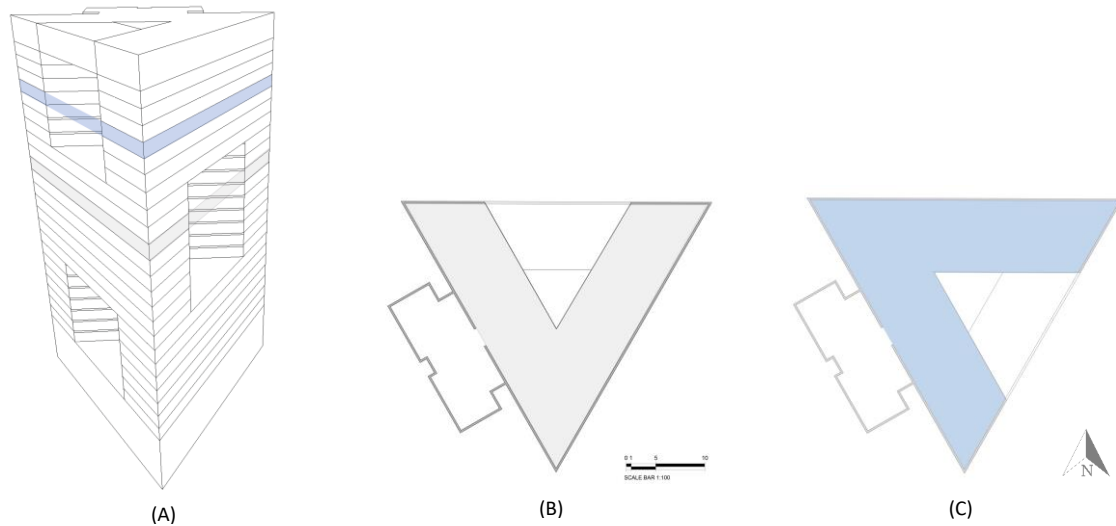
A. 3D view of the NCB building in IES-VE, B. floor 16 (F1- north opening), C. Floor 22 (F2- southeast opening).
